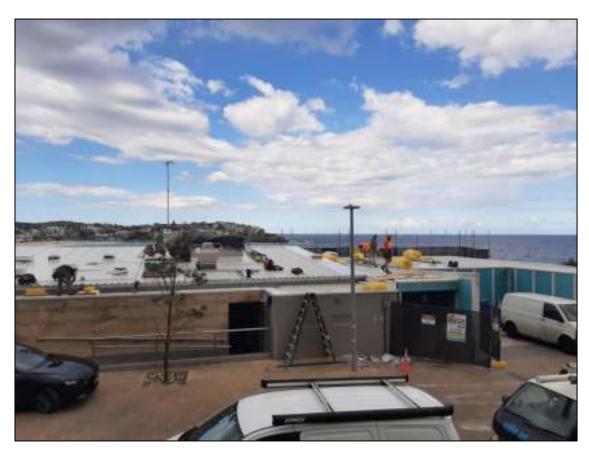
Site viewed from Notts Avenue looking north (note existing plant in this section of the roof)
